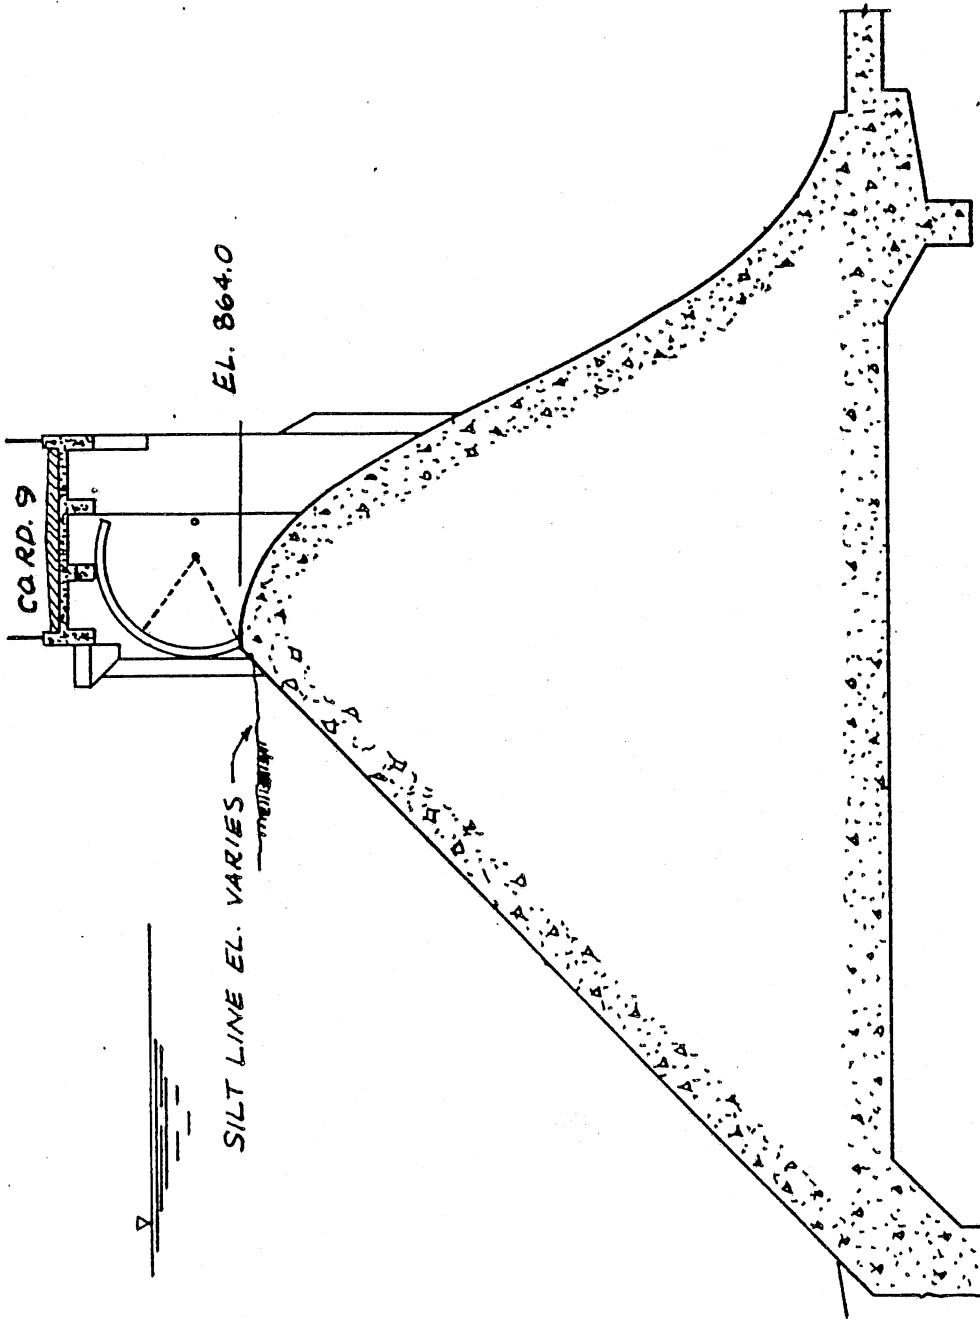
Cross section of the Rapidan Dam spillway.
